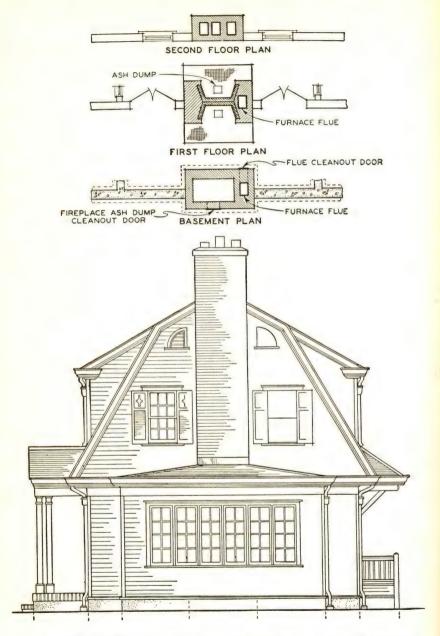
Fireplace Chimney in Frame Wall with Projection on Outside of Residence
